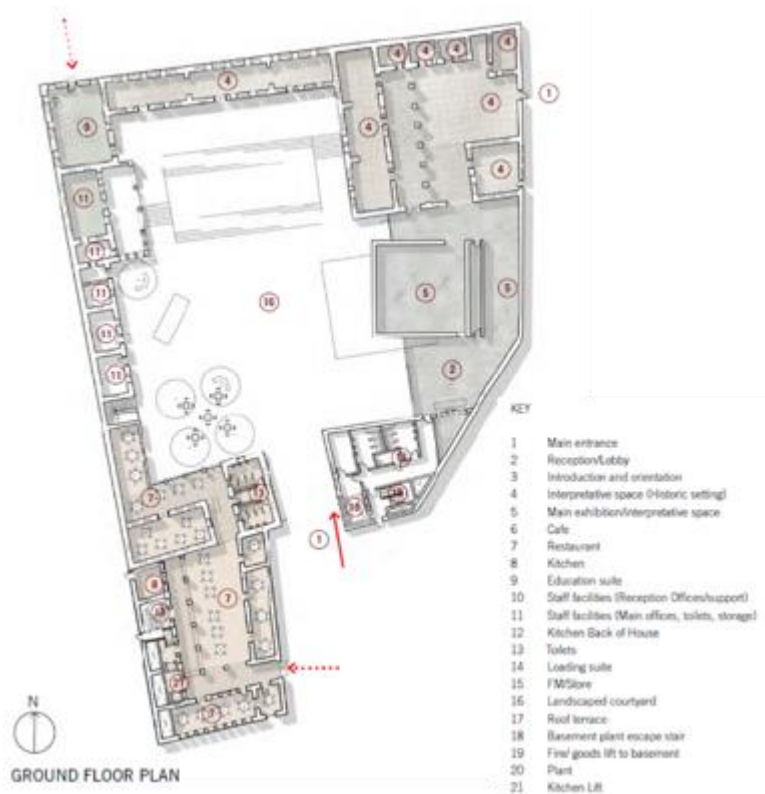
Bayt Company Proposed Ground Floor Plan (Msheireb Properties, 2011)
